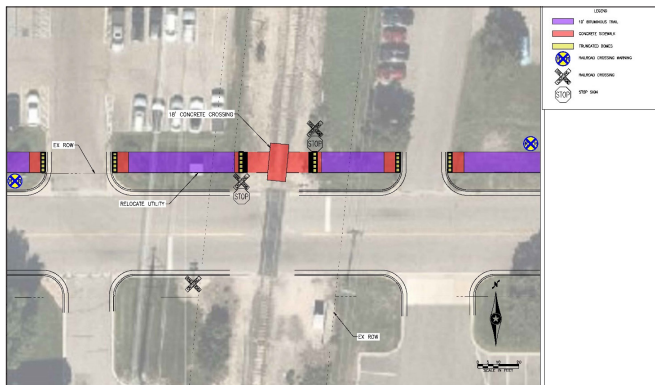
[Dewy Hill Road Railroad Crossing](#)
